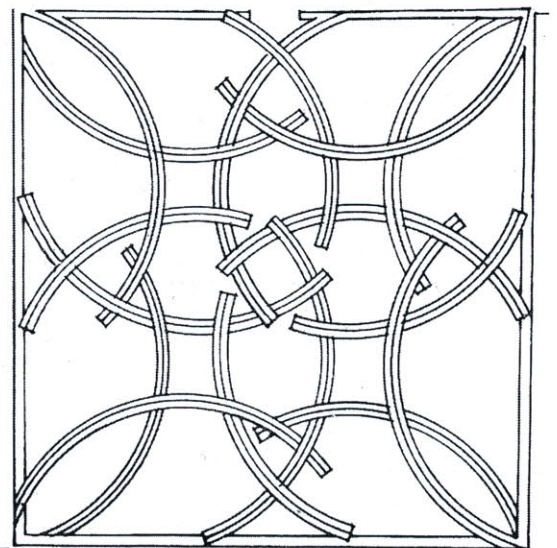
Reconstruction of the vault plan based on the sketch drawing.
